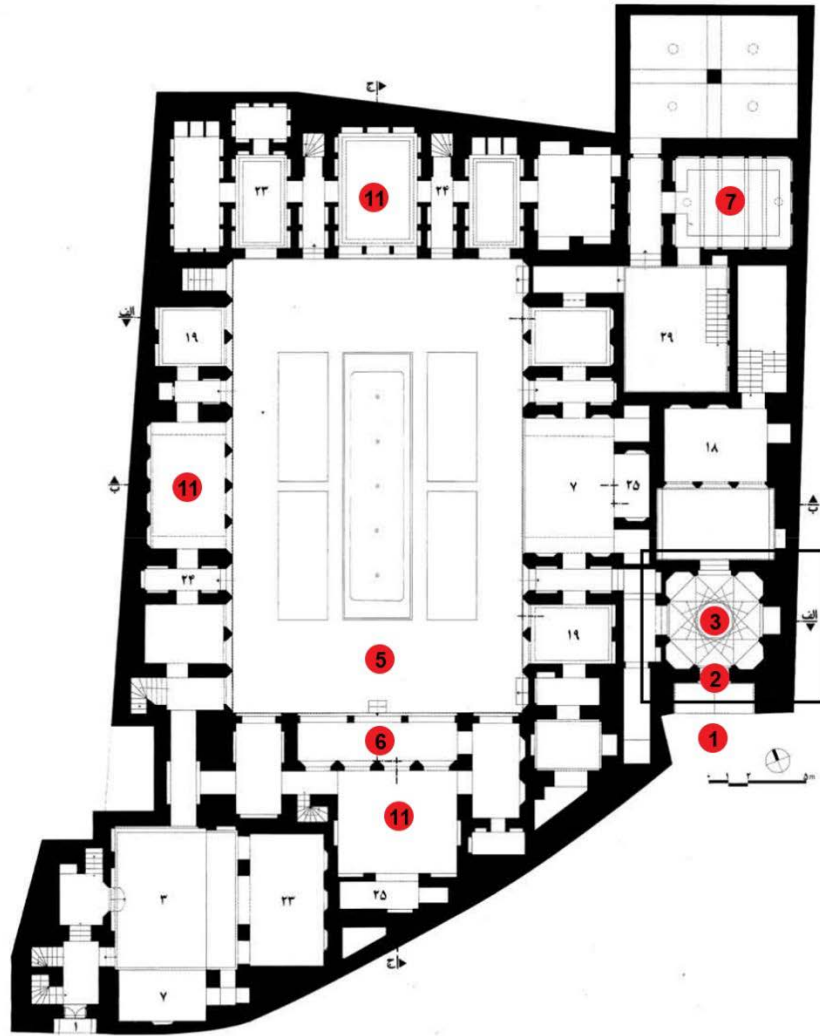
Plan of the first story of Akhavan Sigari Yazd house²⁹
